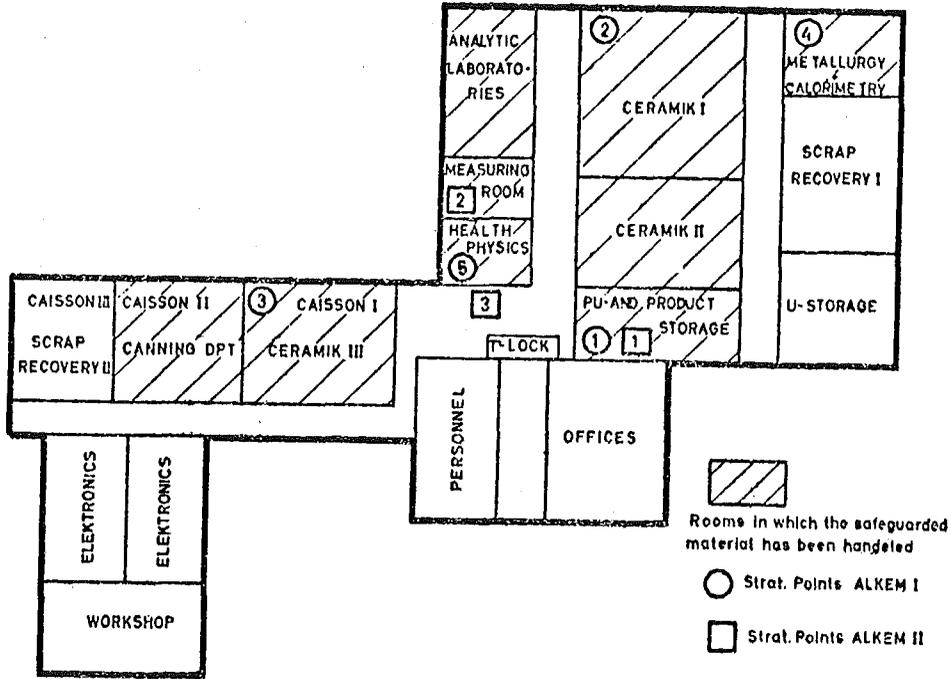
Layout of the old ALKEM fabrication plant (Anlage I)
